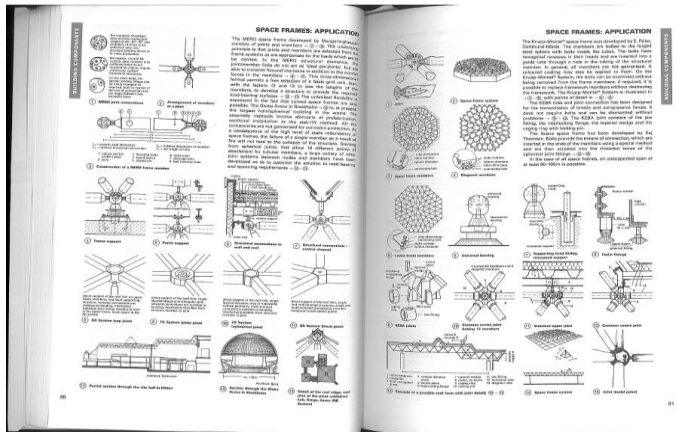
Examples of architectural works of pure engineering conception taken from fundamental architectural works: couplings and joints used in civil construction works.
